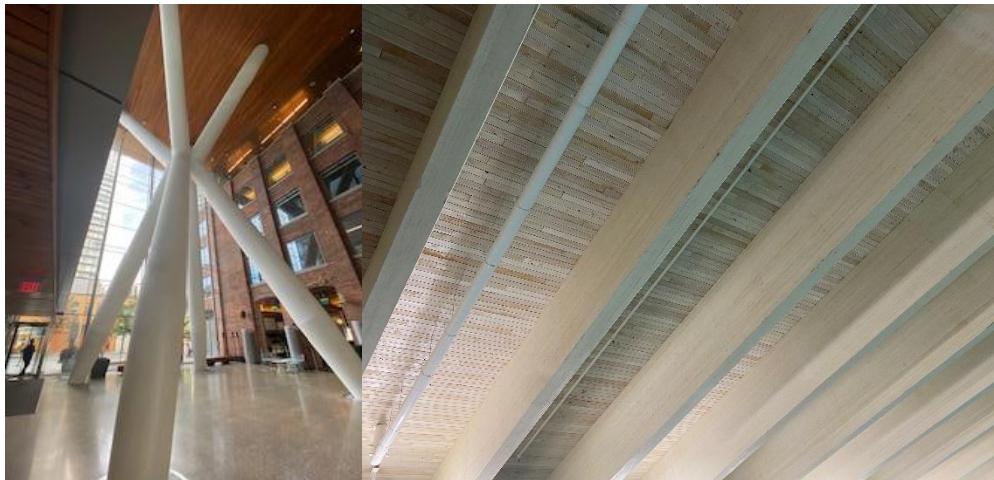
Examples of modern steel and timber construction in Canada (Author's photos).
